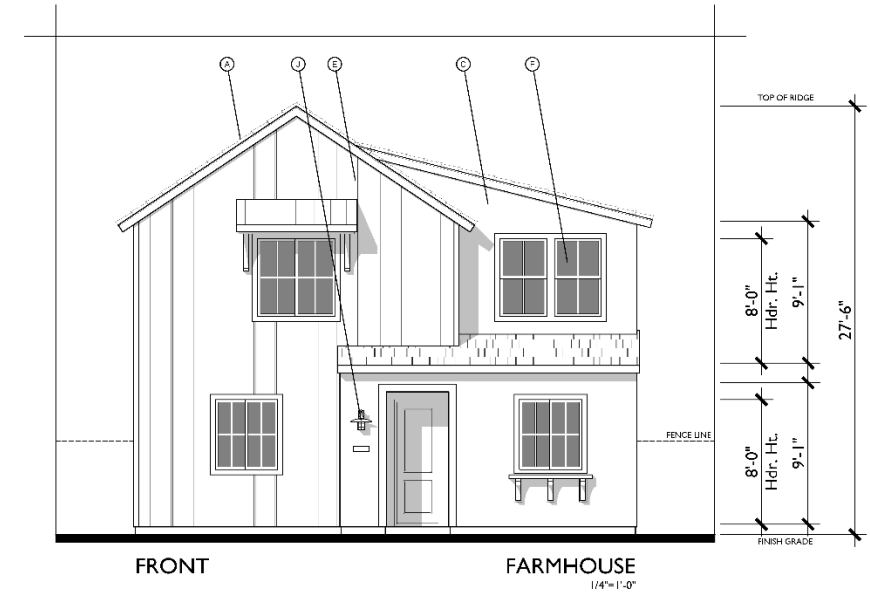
Farmhouse Elevation - Cluster Plan 1
